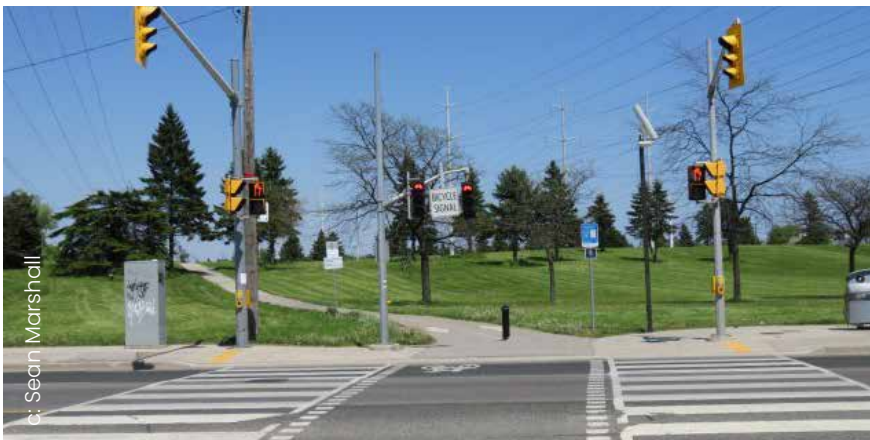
Example of a multi-use crossing with signage and pavement markings.
